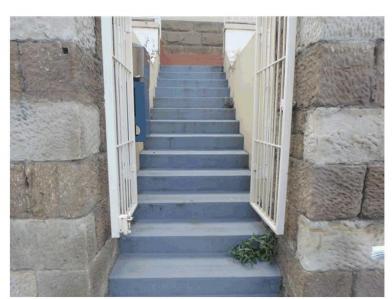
The main entrance through the stone wall feature showing the original sandstone pillars on the wall entrance and the later addition of the concrete stairs
